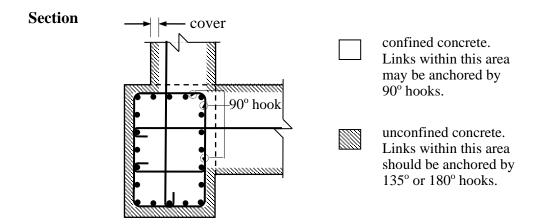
Confined and unconfined concrete regions of a beam-column joint
